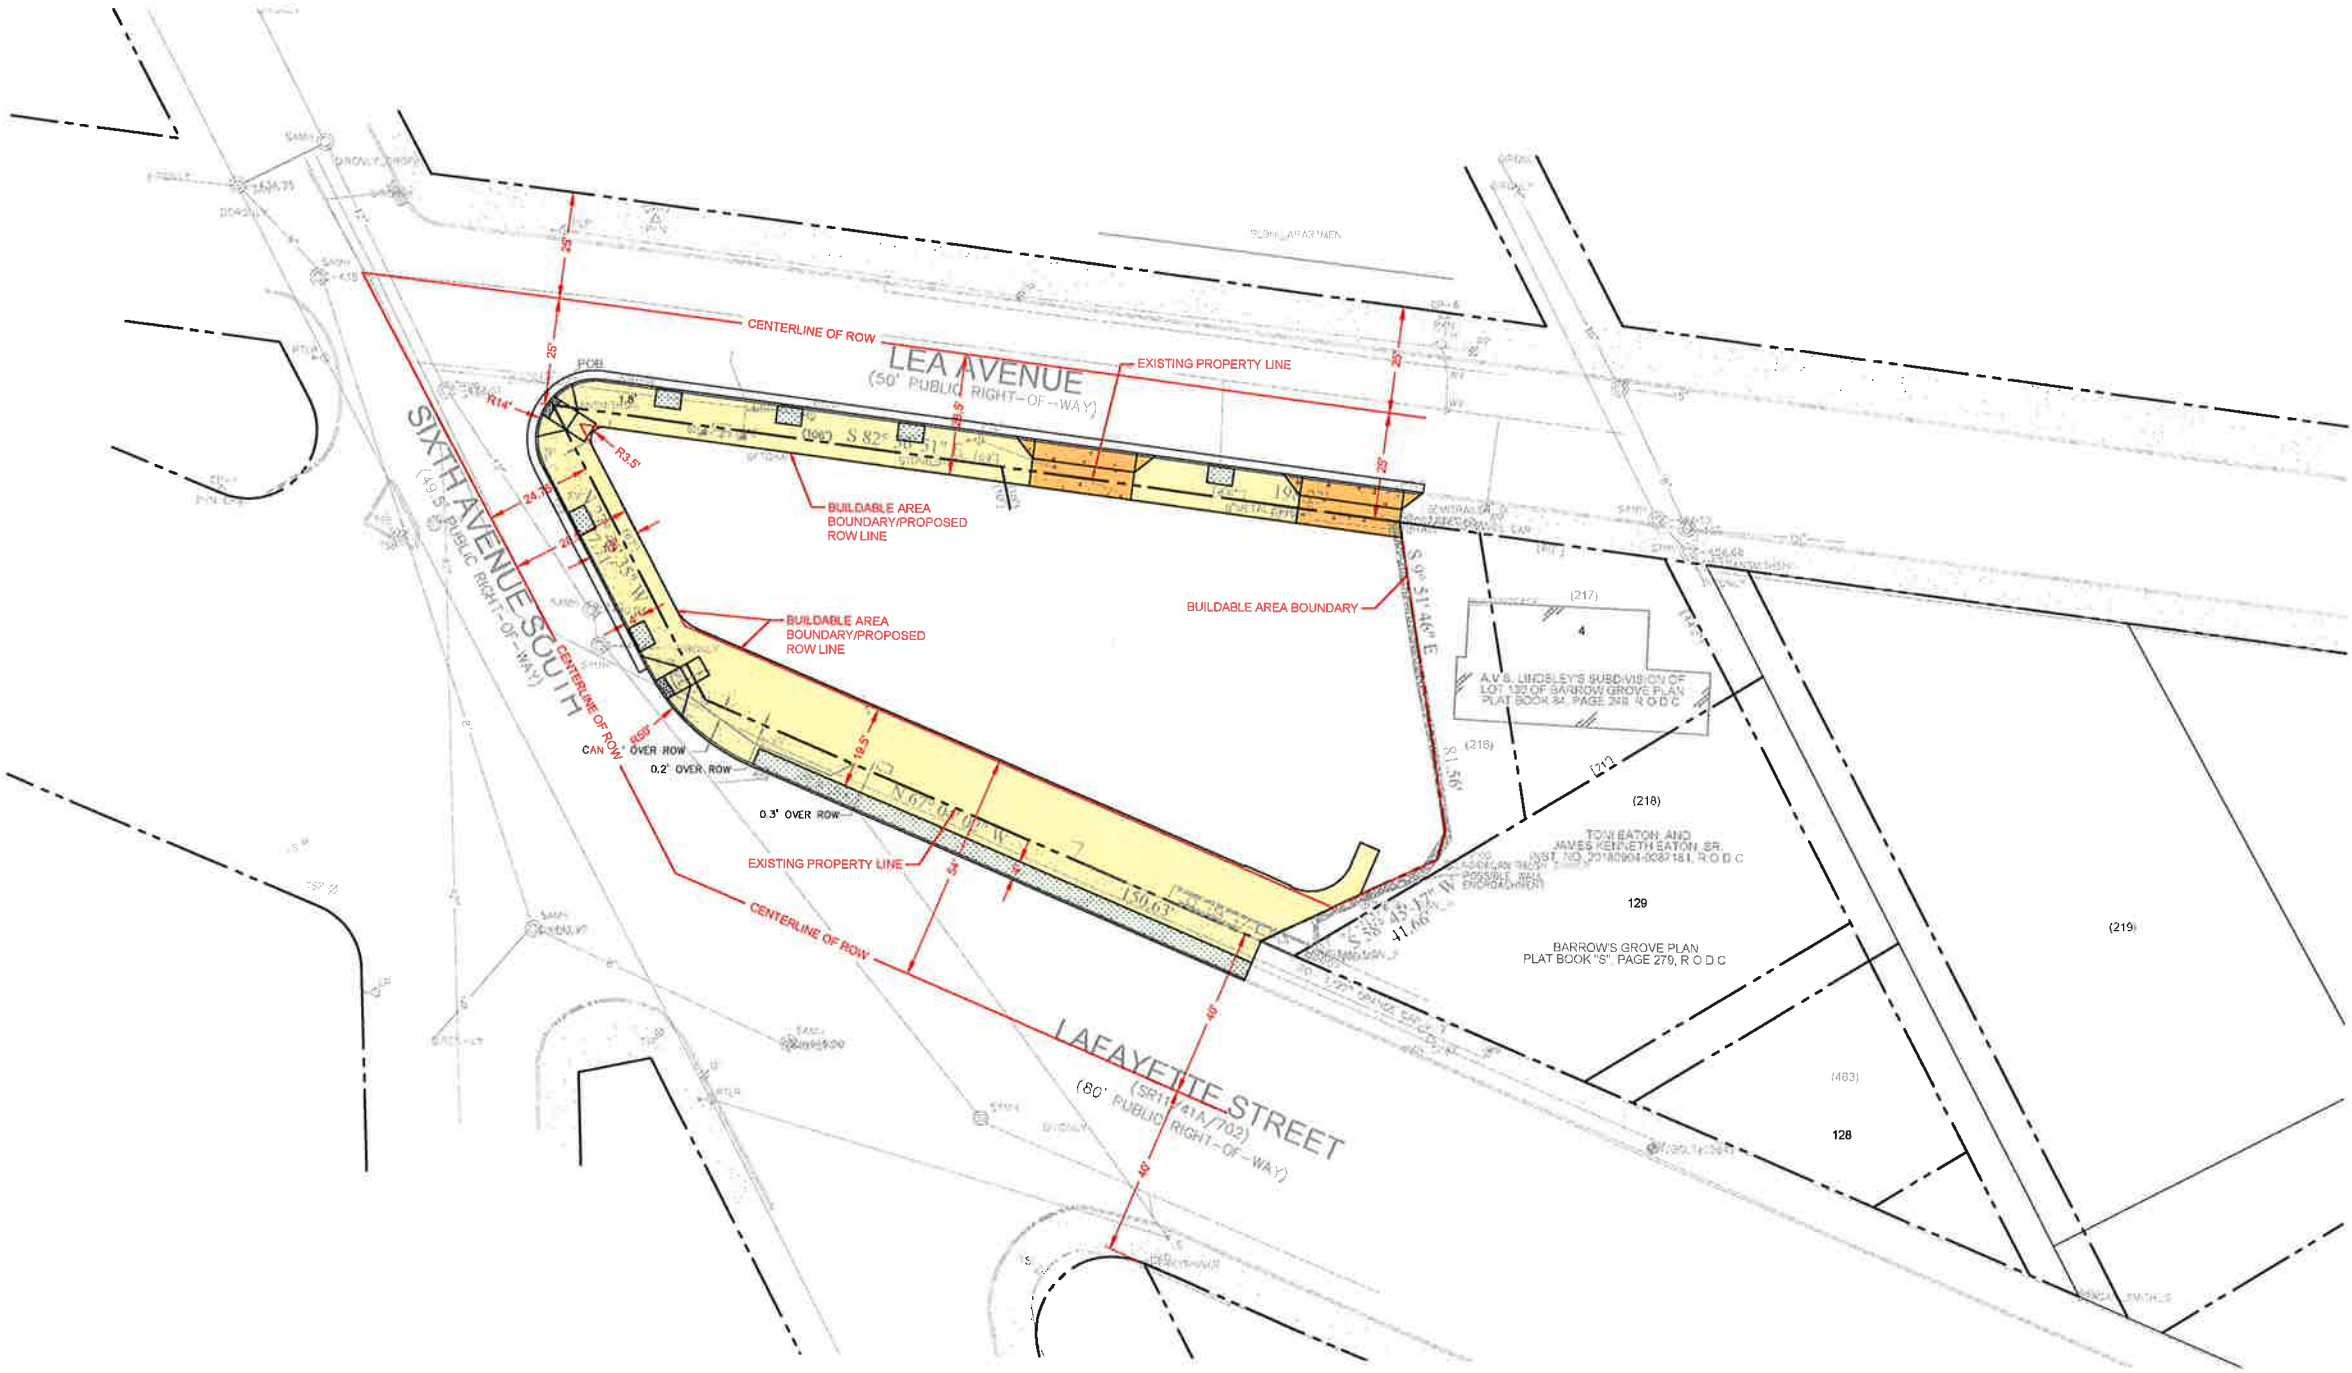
Lafayette Street Recommended Design Concept with Transit Boarding
